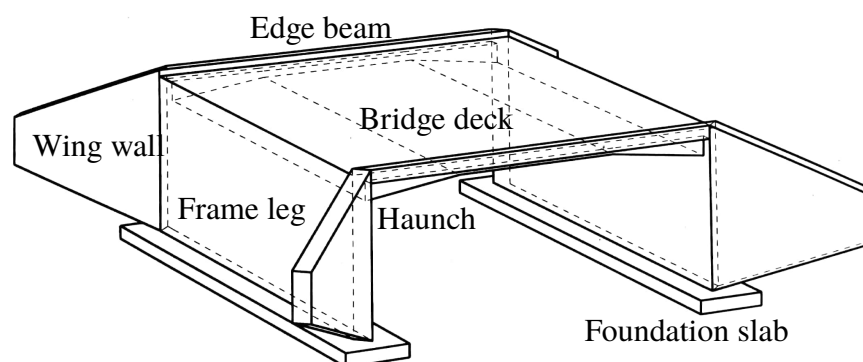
Typical single-span slab frame bridge. *Reproduction from Sundquist (2008).
